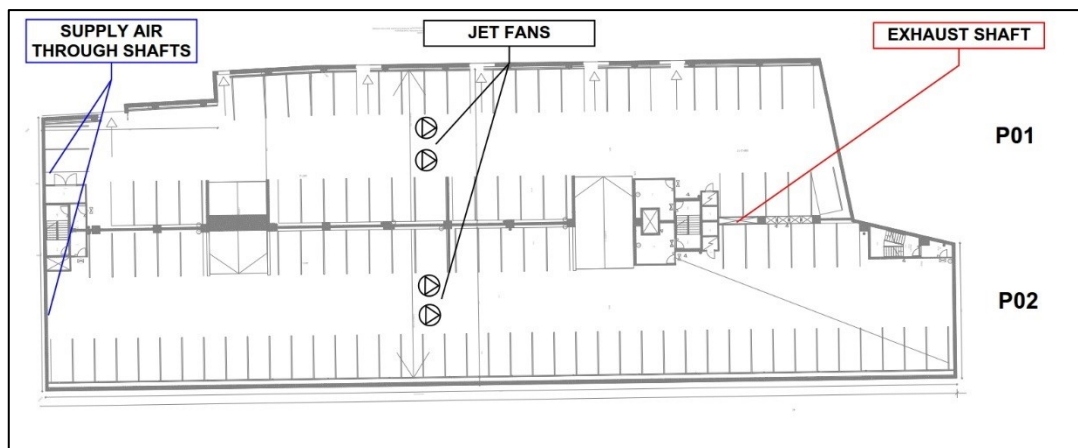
Floor plan and ventilation configuration for decks P01, P02
